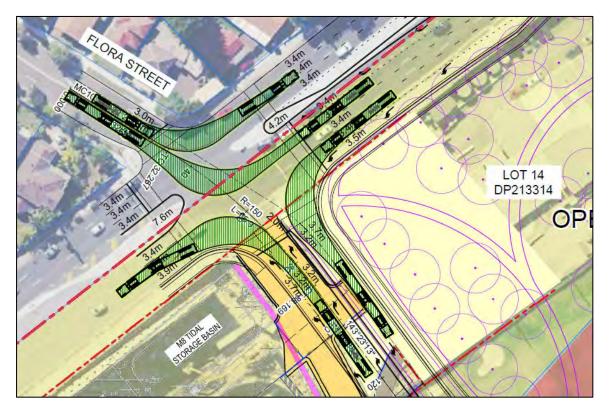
Intersection design – Marsh Street / Flora Street Source: Arup
